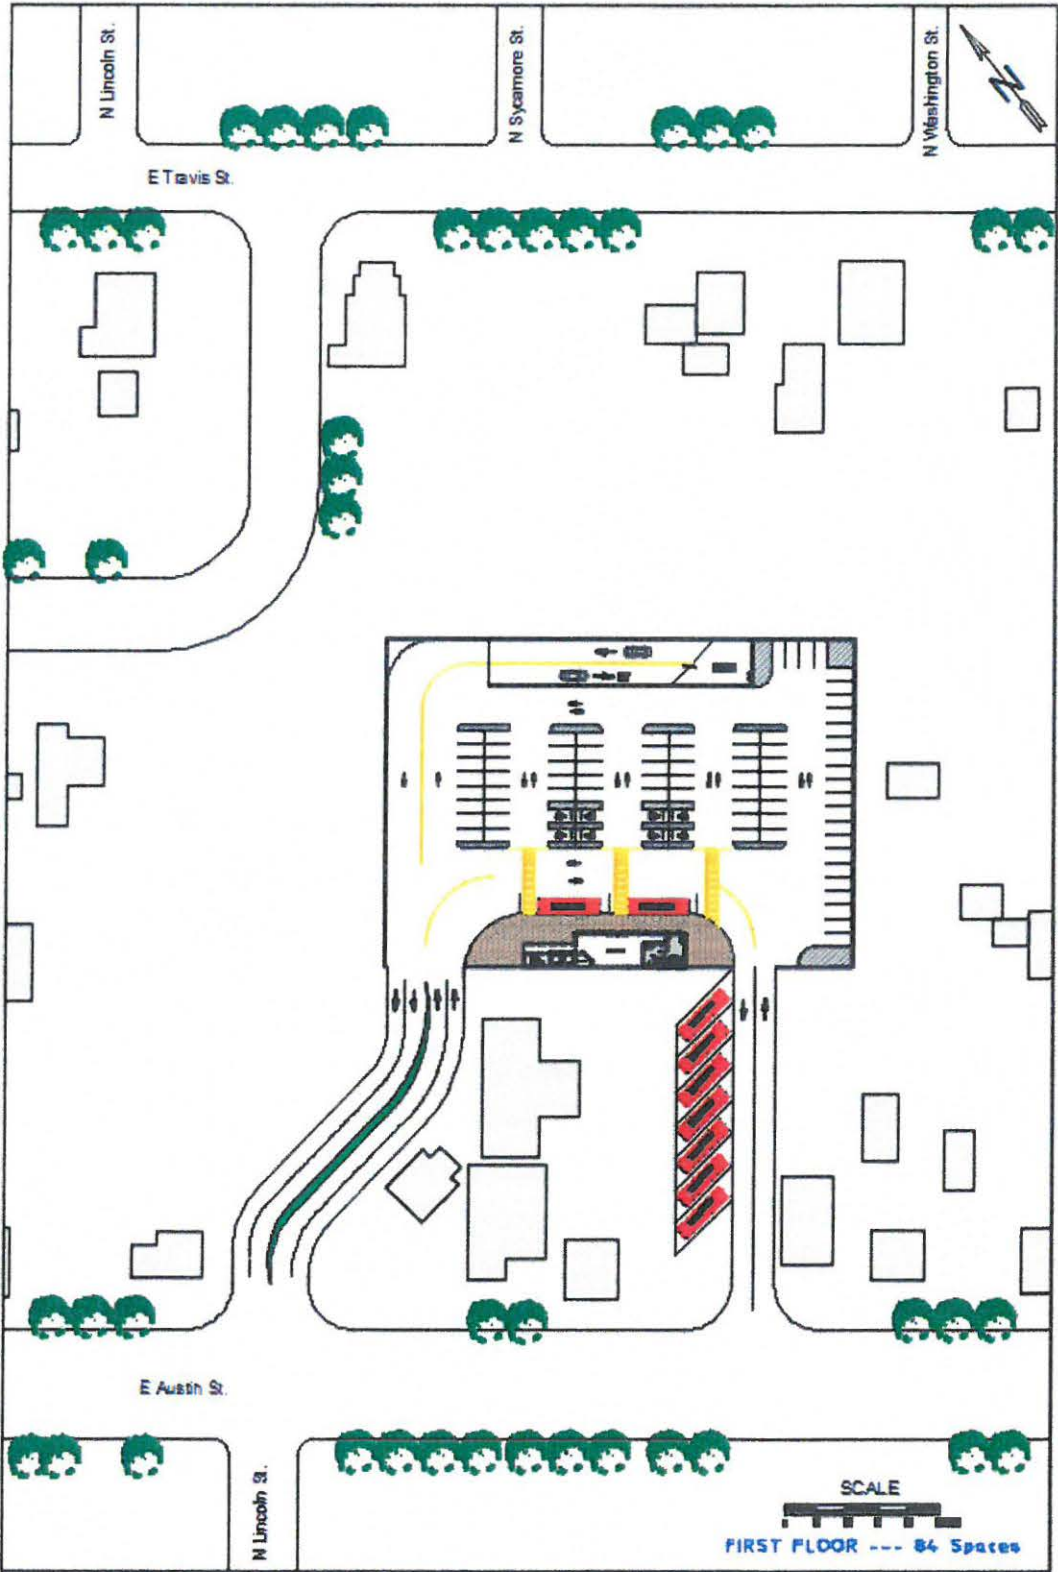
Figure X: Fredericksburg Potential Parking Center and Transportation Terminal Site Plan 2
